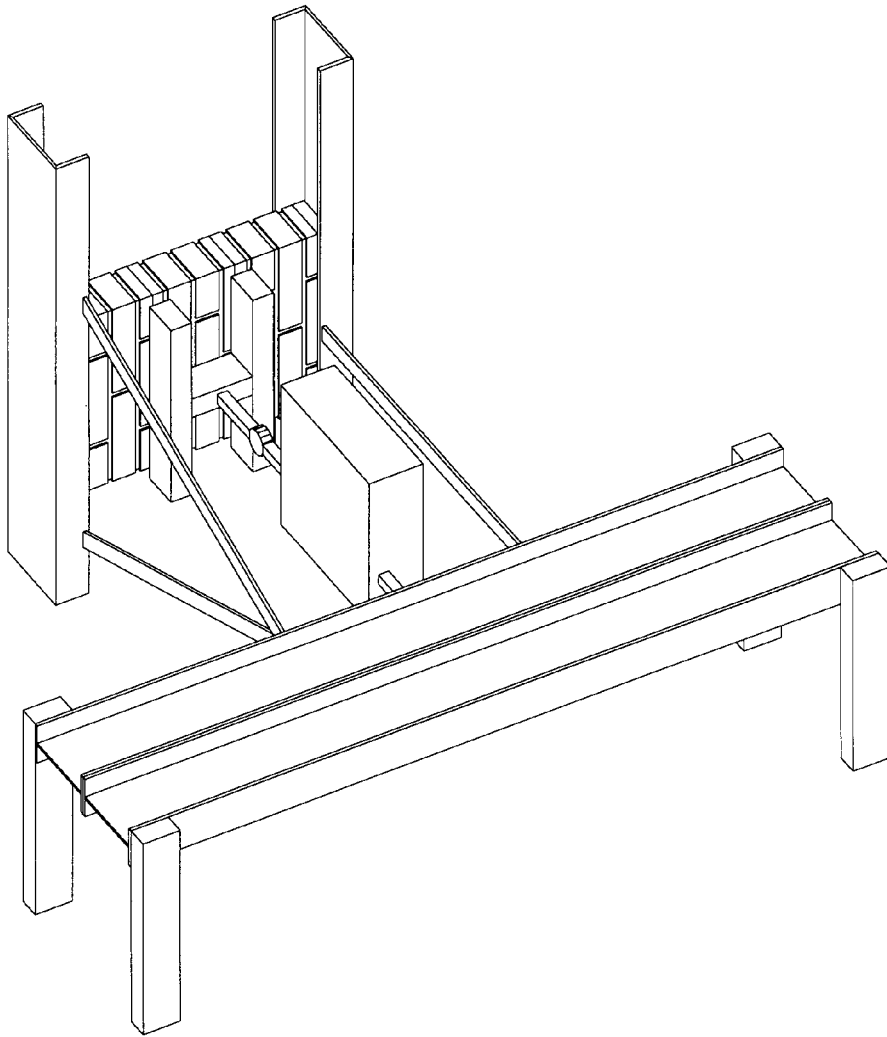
Test setup for bending tests with a bending axis parallel to the bed joints.
